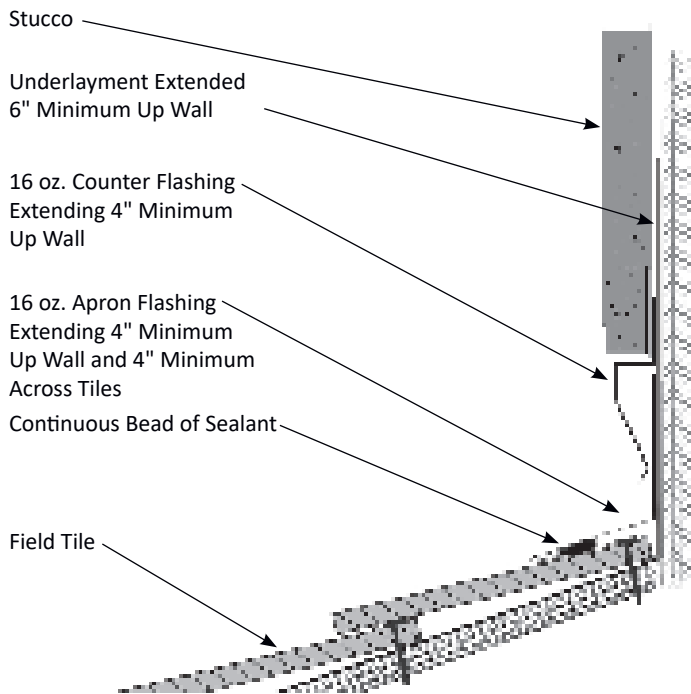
Counter Flashing & Apron Flashing at Stucco Head Wall
